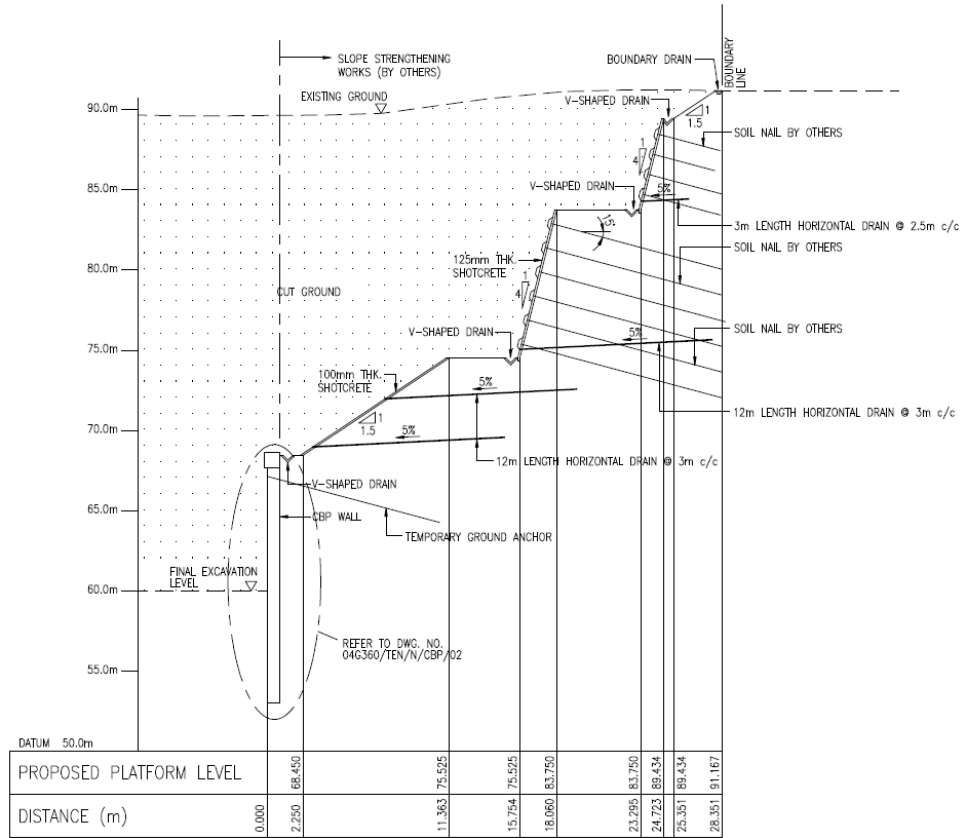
Original design of retaining wall system using conventional CBP wall with temporary ground anchors.
